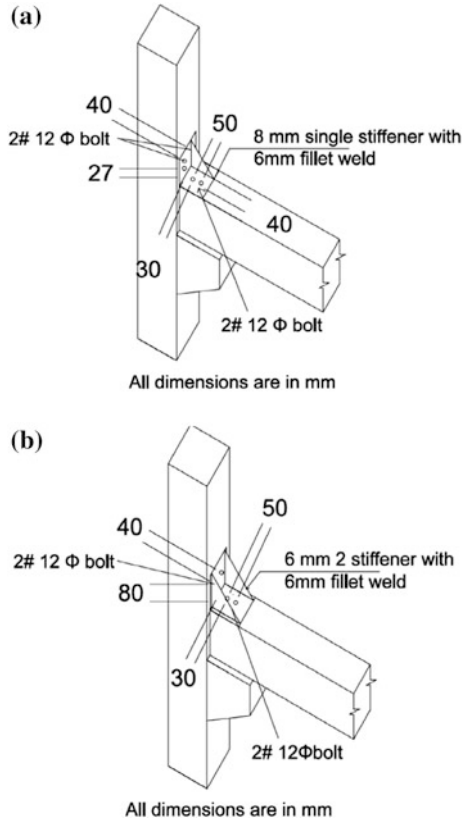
Detailing of dry precast beam column connections a single stiffener and b double stiffener
